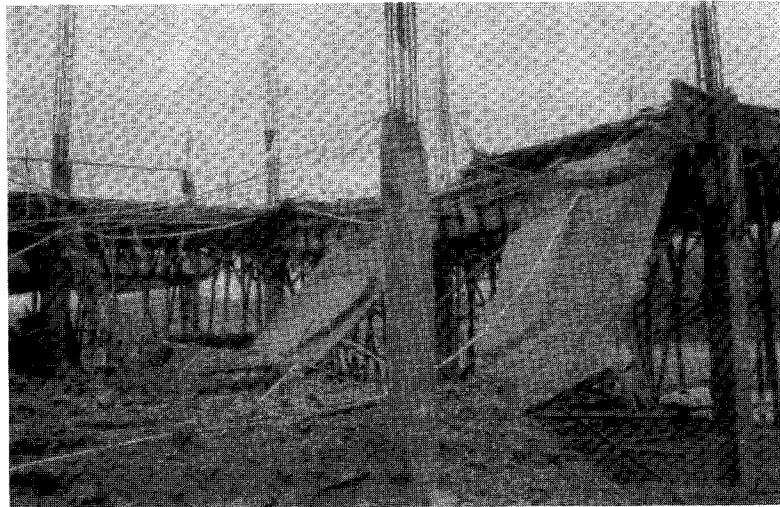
The collapse of beams and slabs during construction of a building due to poorly constructed forms and temporary works.
